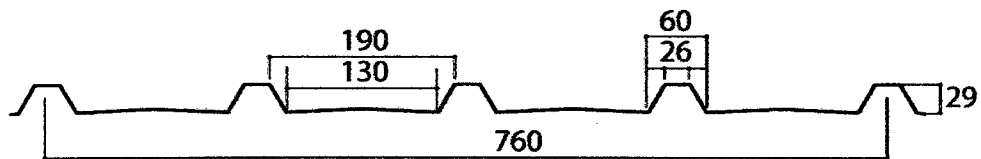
Cross Section of Trimdek Profiled Steel Sheeting
